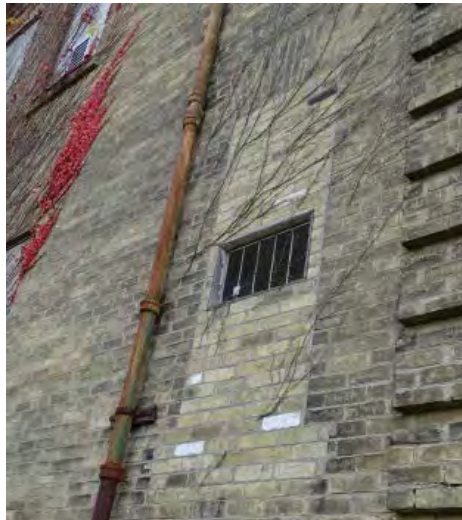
West Wing – North Elevation (Photo No. 86.3)
